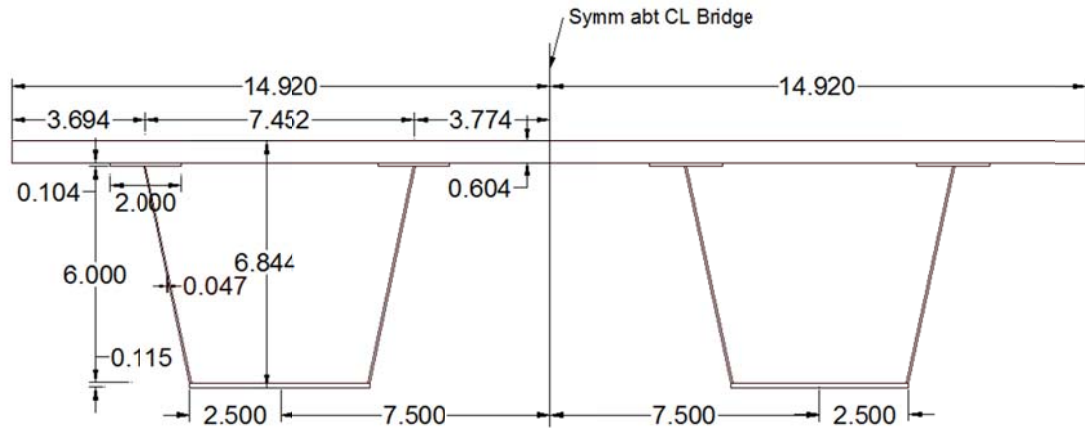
Typical steel BOX cross section (2) for L = 120ft at pier location
